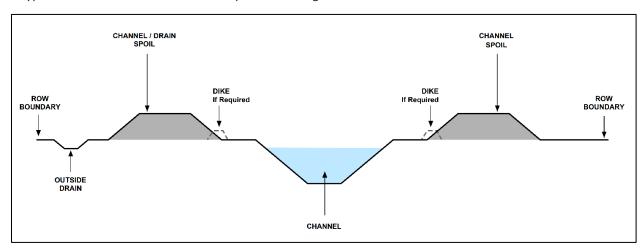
Typical Cross-Section of the Lake Manitoba Outlet Channel
